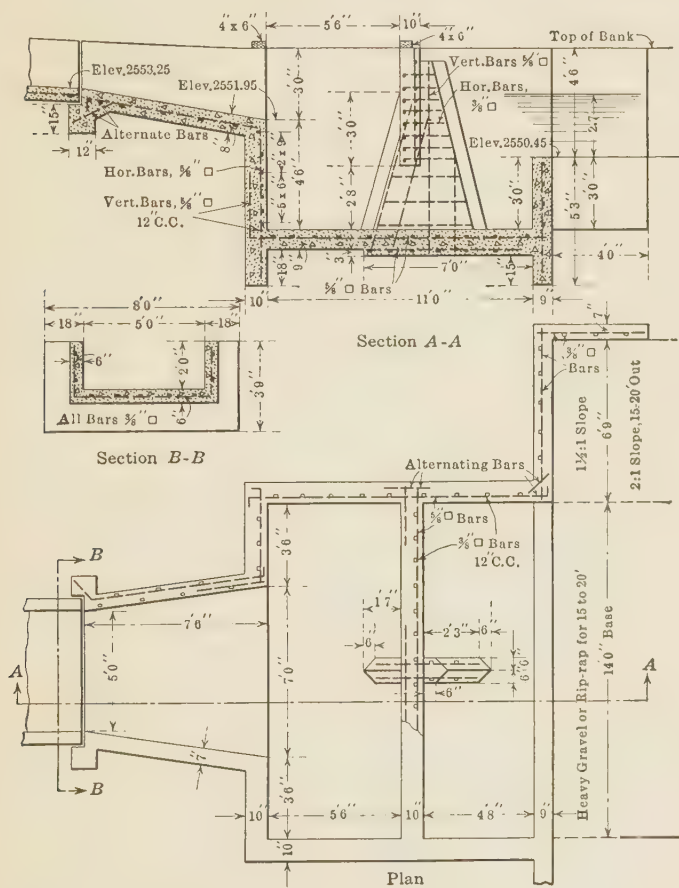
Receiving box with baffle wall at chute outlet.
